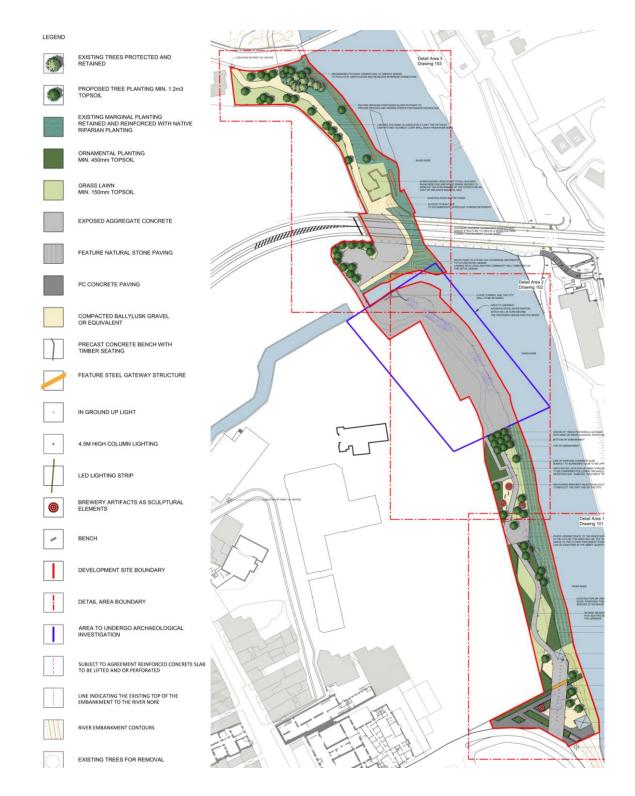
Riverfront Park – detailed proposal (Masterplan, 2015)
